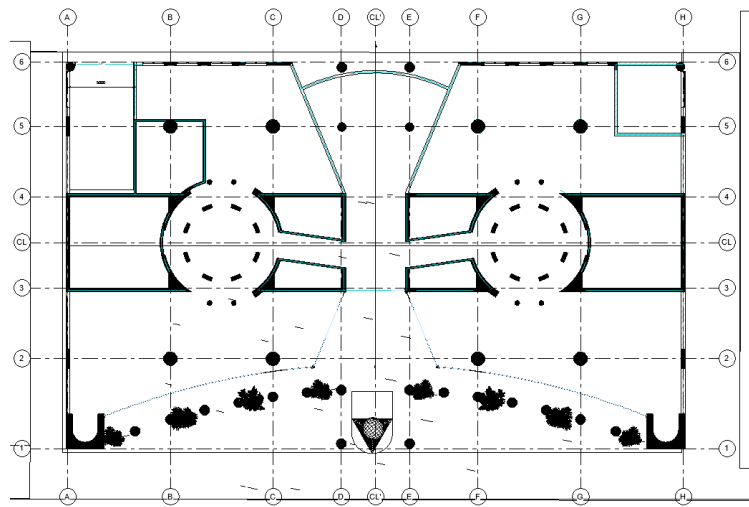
Image showing Ground Floor Plan of Nation Centre Building.
